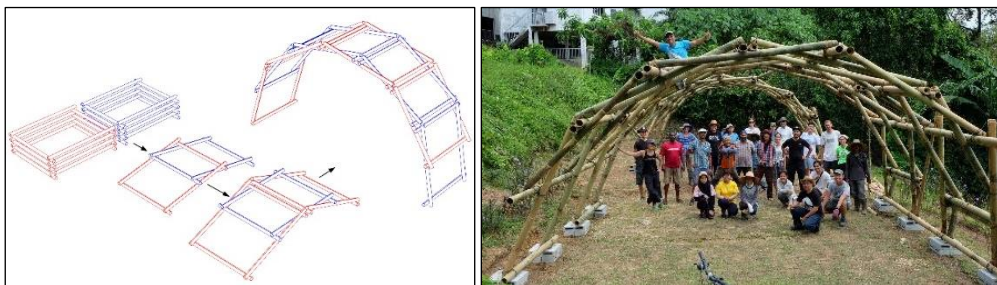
Modular Reciprocal Tunnel: Schematic and Built Pavilion
